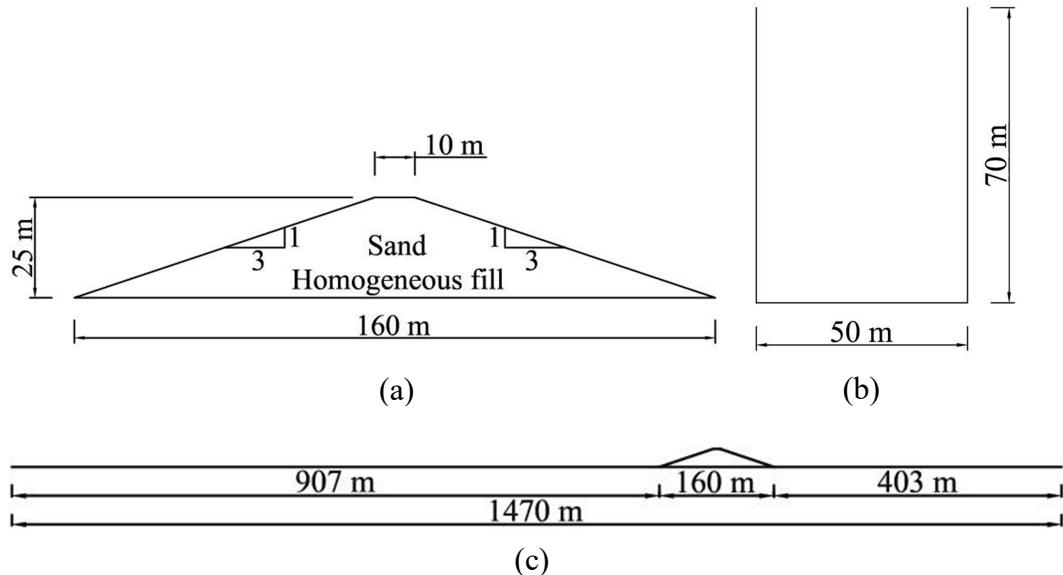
Views of the deterministic model a) dam cross-section b) channel cross-section c) channel longitudinal view
